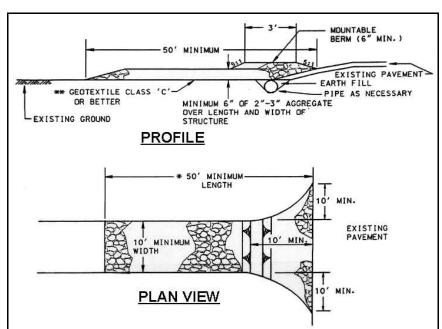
Stabilized construction entrance details (*Maryland Department of the Environment, 1994*).
